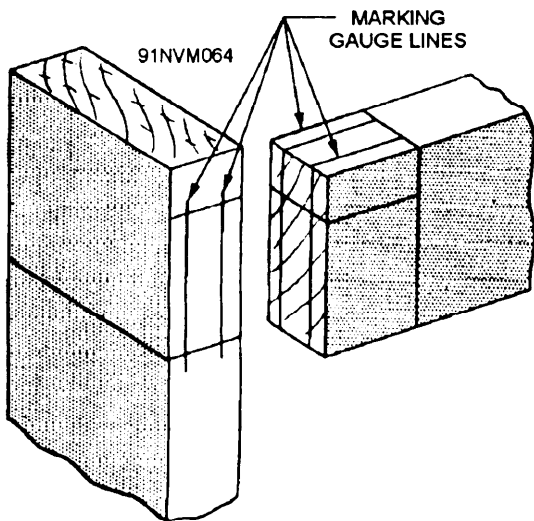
Layout of a stub mortise-and-tenon joint.
